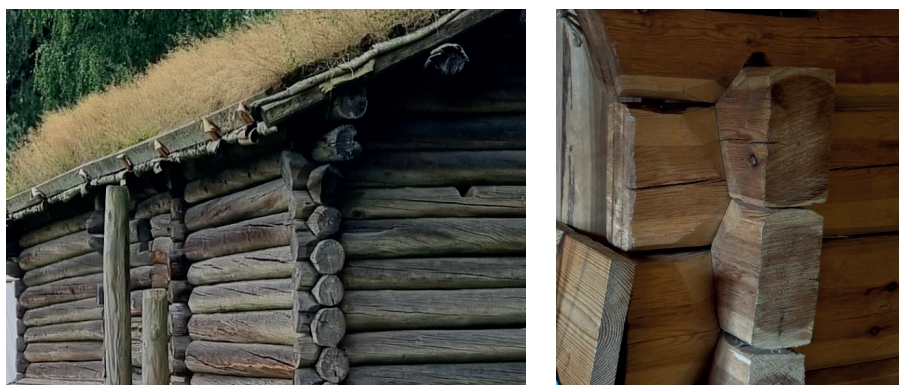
Carpentry joints in wall corners – round beams (left), hewn beams (right)
